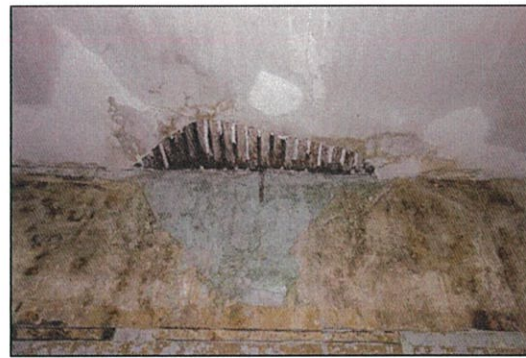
View to lathe and plaster structure and decayed plastering, Bedroom 1.
